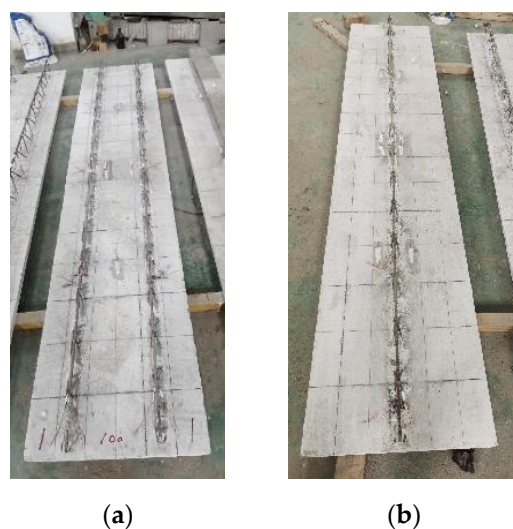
Photograph of prefabricated laminated slab bottom specimen: (a) YZB1; (b) YZB4.
